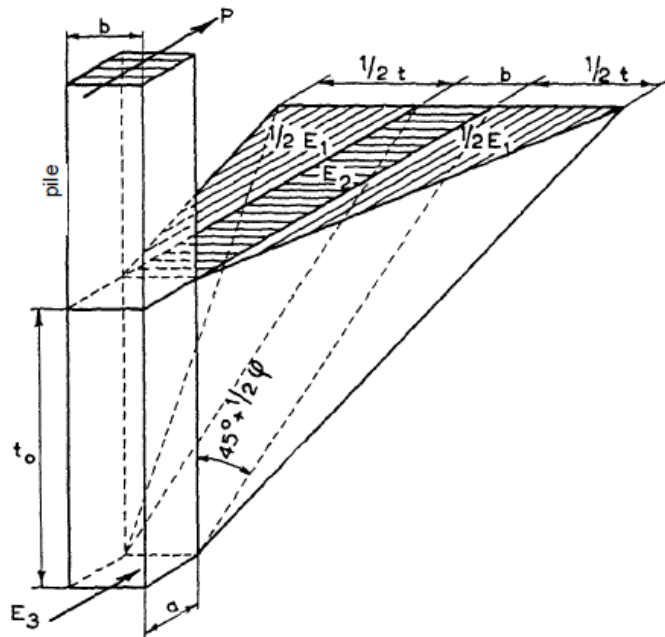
area contributing to stability of the soil around horizontally loaded piles
